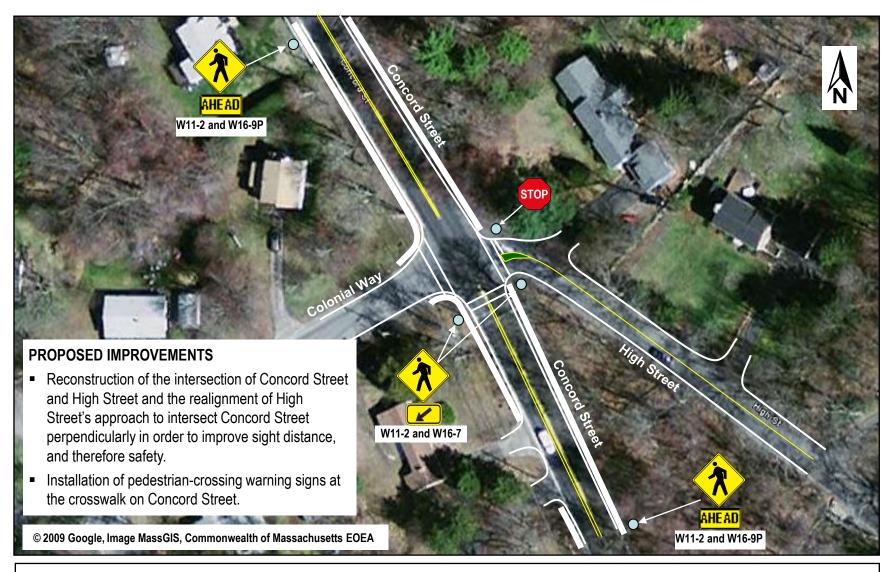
Concord Street and High Street Intersection: Proposed Improvements
